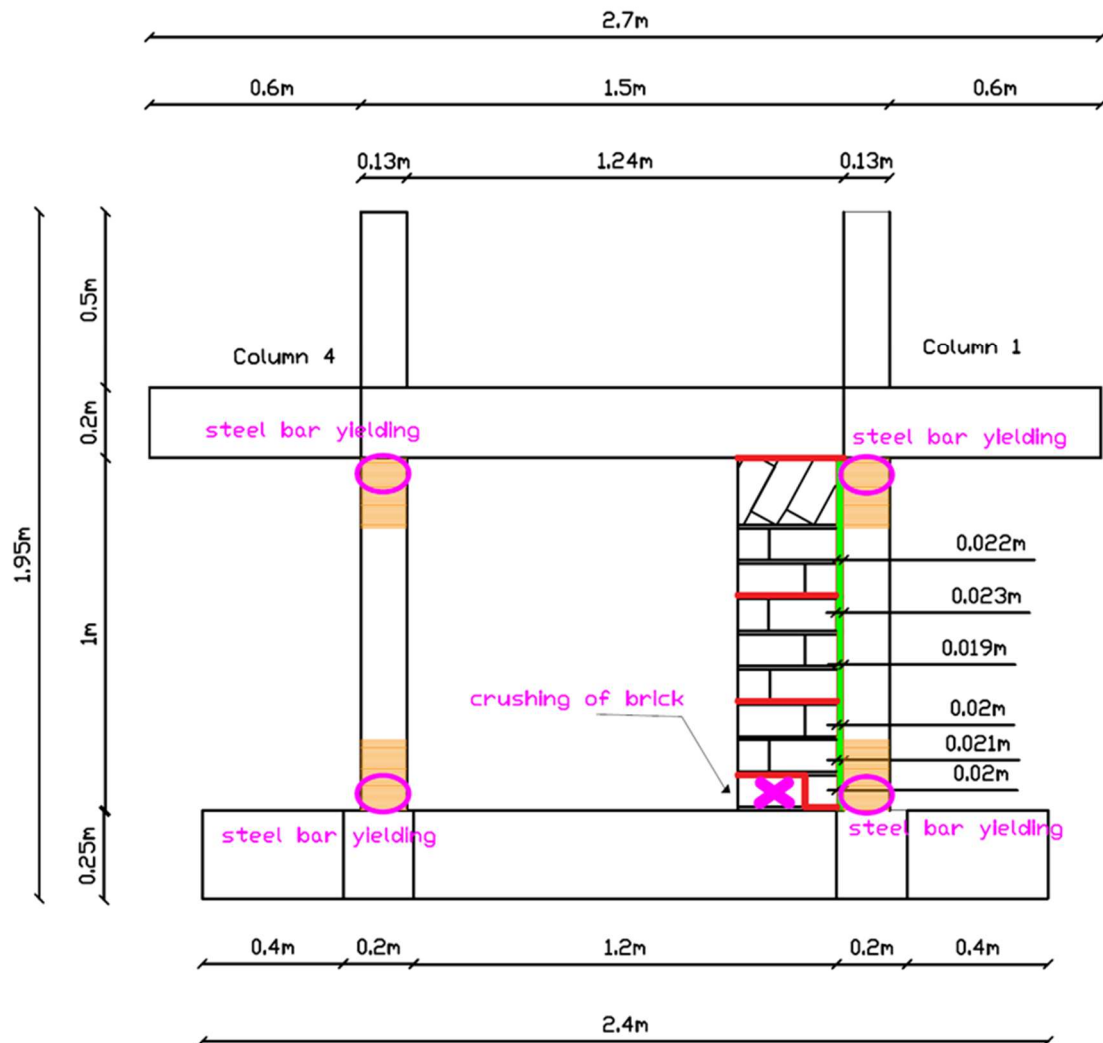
Observed damage after EQ1.3g(2) test: Damage with crushing of bottom brick at partial infill wall occurred. The columns entered yielding strain of their longitudinal steel reinforcements at the bottom and at the top critical regions (columns 1, 4).
